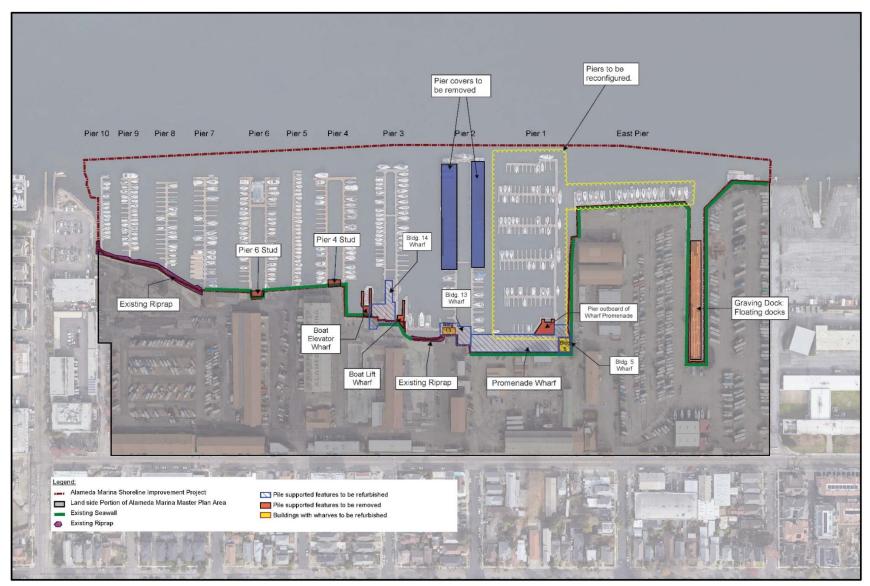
Existing Features Requiring Pile Installation and/or Removal (IHA application packet Figure 3)
